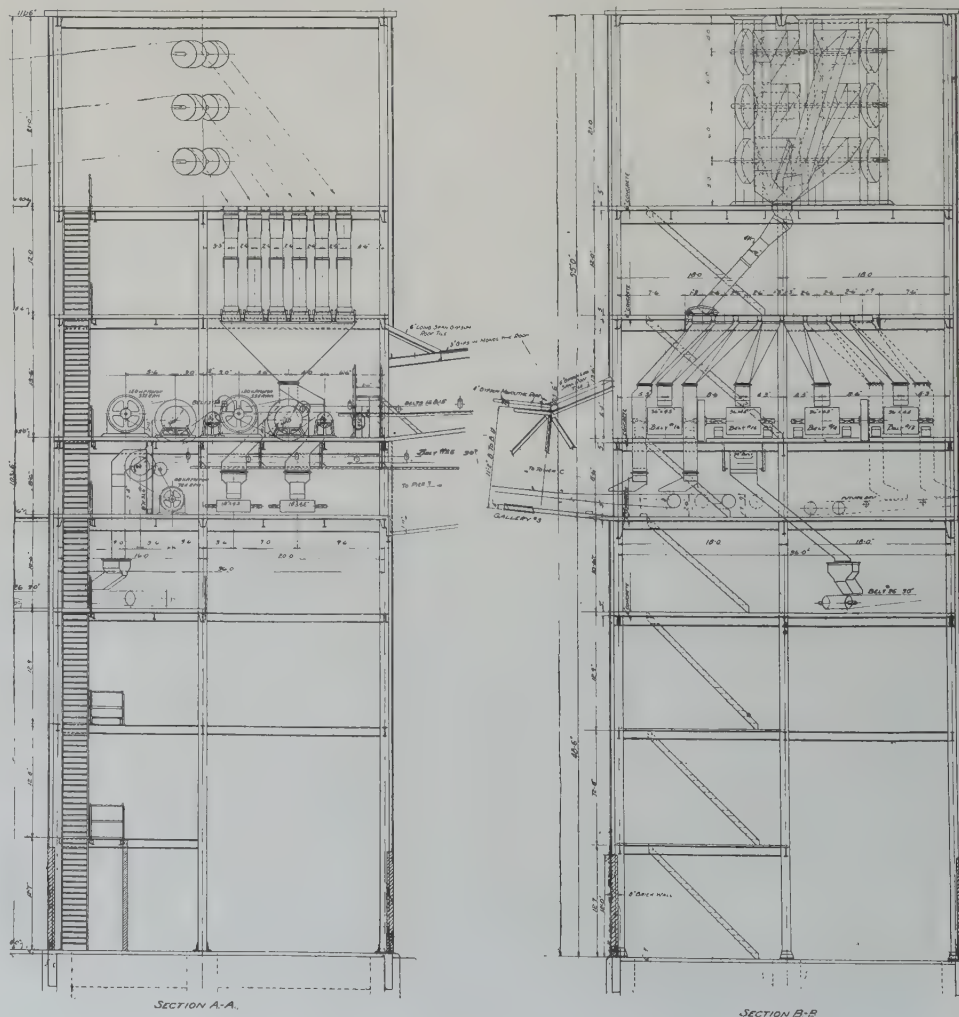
B. & O. Elevator. Sectional Elevations of Tower "B" of Conveyor Gallery System.
